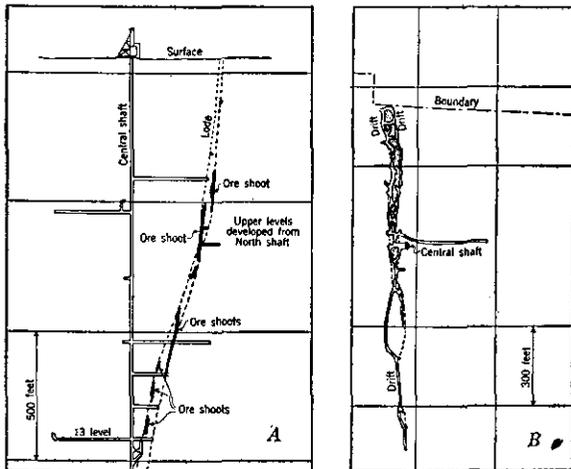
Development of single lode, split at one end forming a hanging-wall ore body and a foot-wall ore body: *A*, Section through central shaft; *B*, plan of 13 level, Teck-Hughes mine
